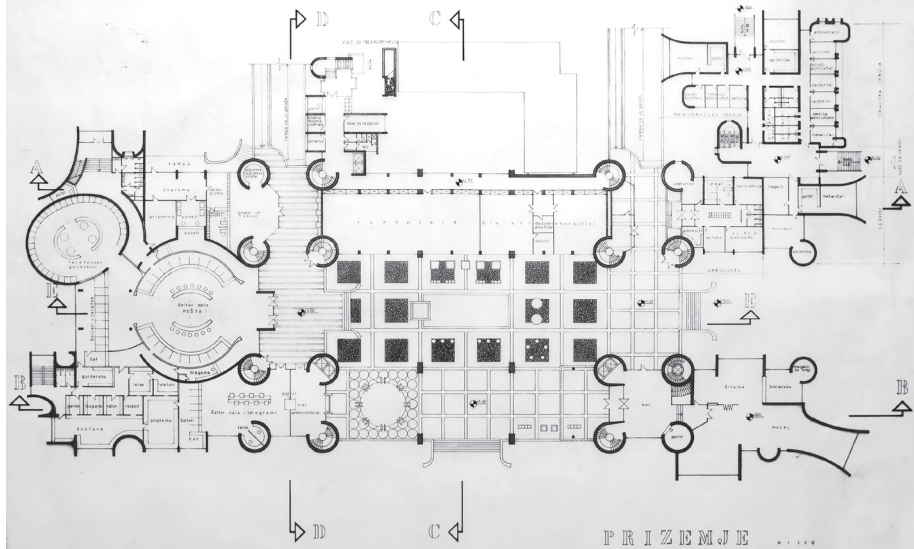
Telecommunication Center. First design proposal, ground floor plan
